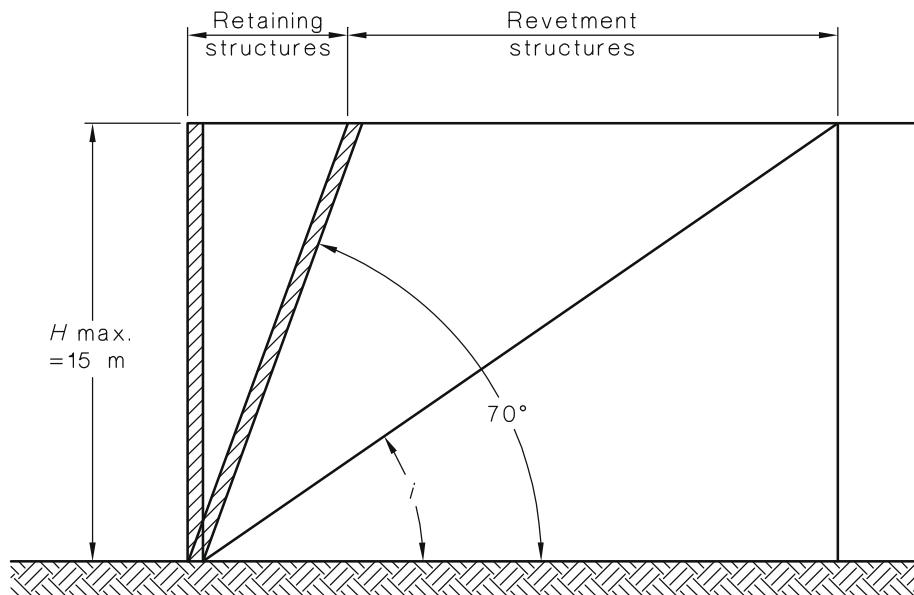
RETAINING AND REVETMENT STRUCTURES
